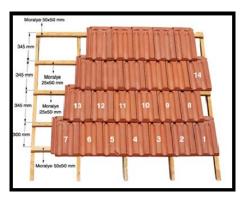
Marseille roofing tile has been used in roof. The roof is in the form of hipped roof
